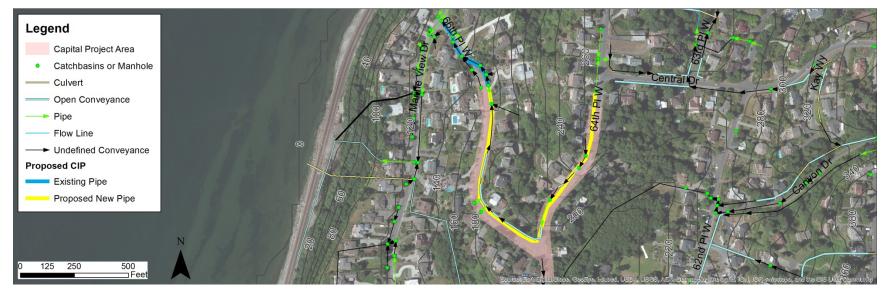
CIP Rank 4 and 5, 64th Place W and 66th Place W Street Drainage Improvements
